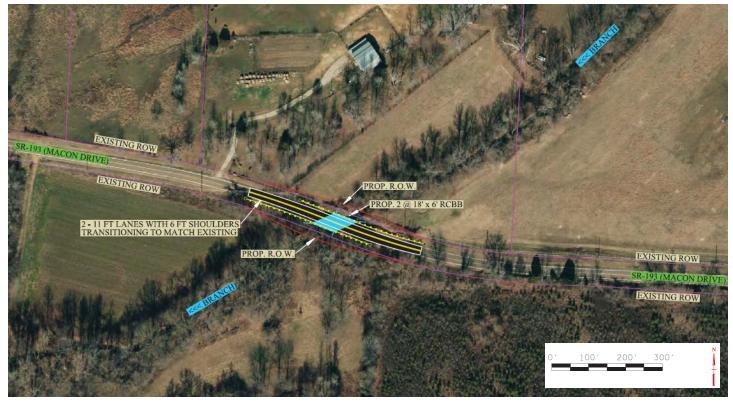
Functional layout for proposed bridge replacement, aerial view. Proposed ROW lines are for planning purposes.
